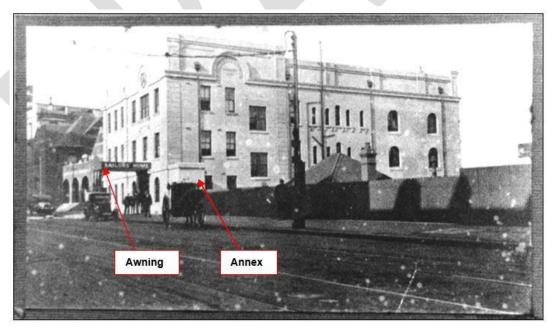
Photograph showing the completed addition and overall form of the building c.1926. The suspended awning to George Street is visible. Note the small annex, entry porch at the south western corner of the building. (Source: SHFA Archives CQW 45)
